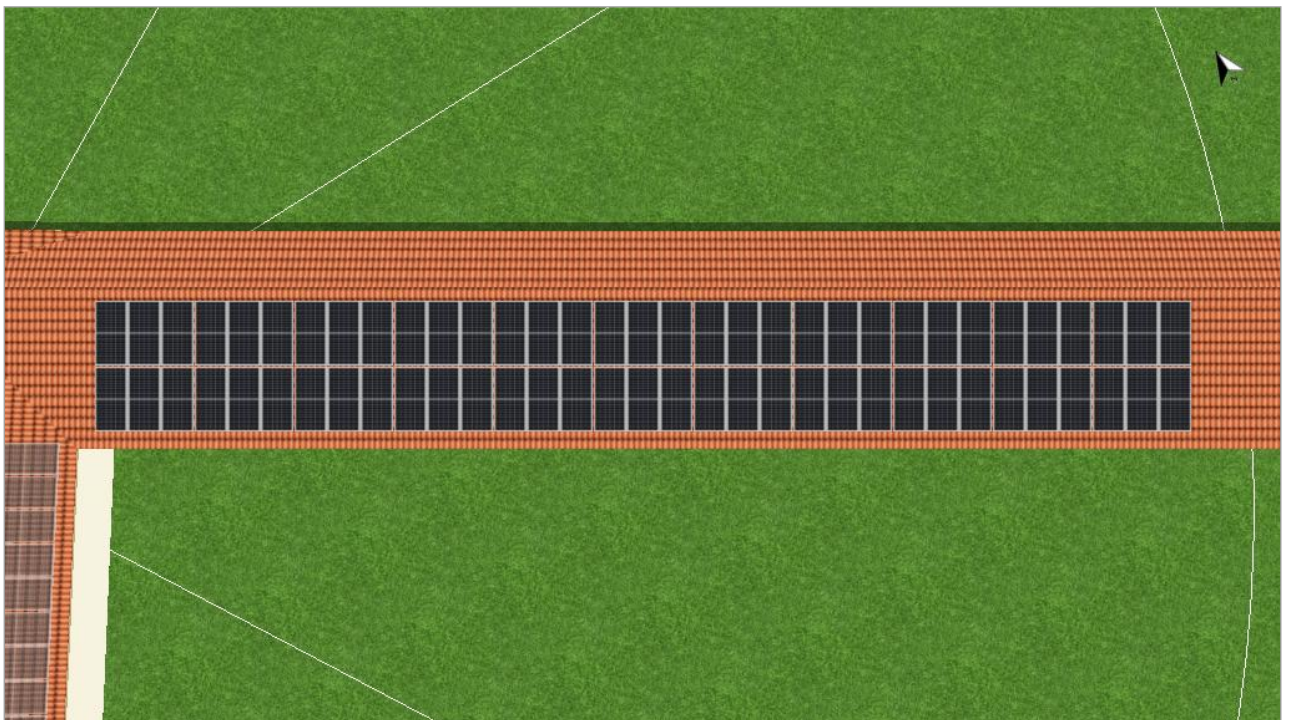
Modulyta - Building 01-Roof Area Southwest
